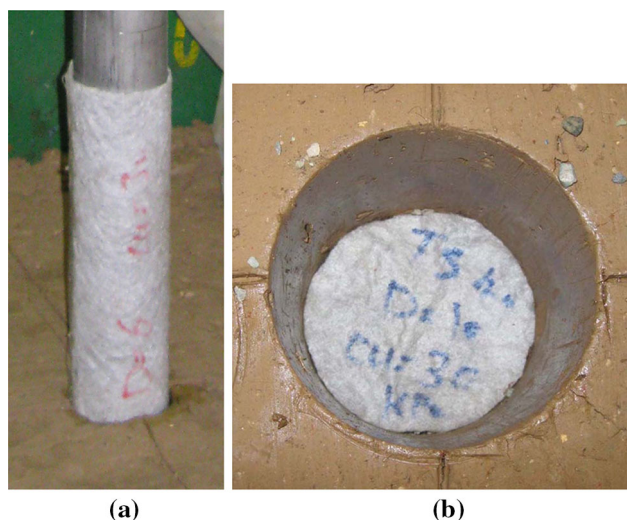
a Insertion of vertical encasement, b placement of horizontal reinforcing sheet
